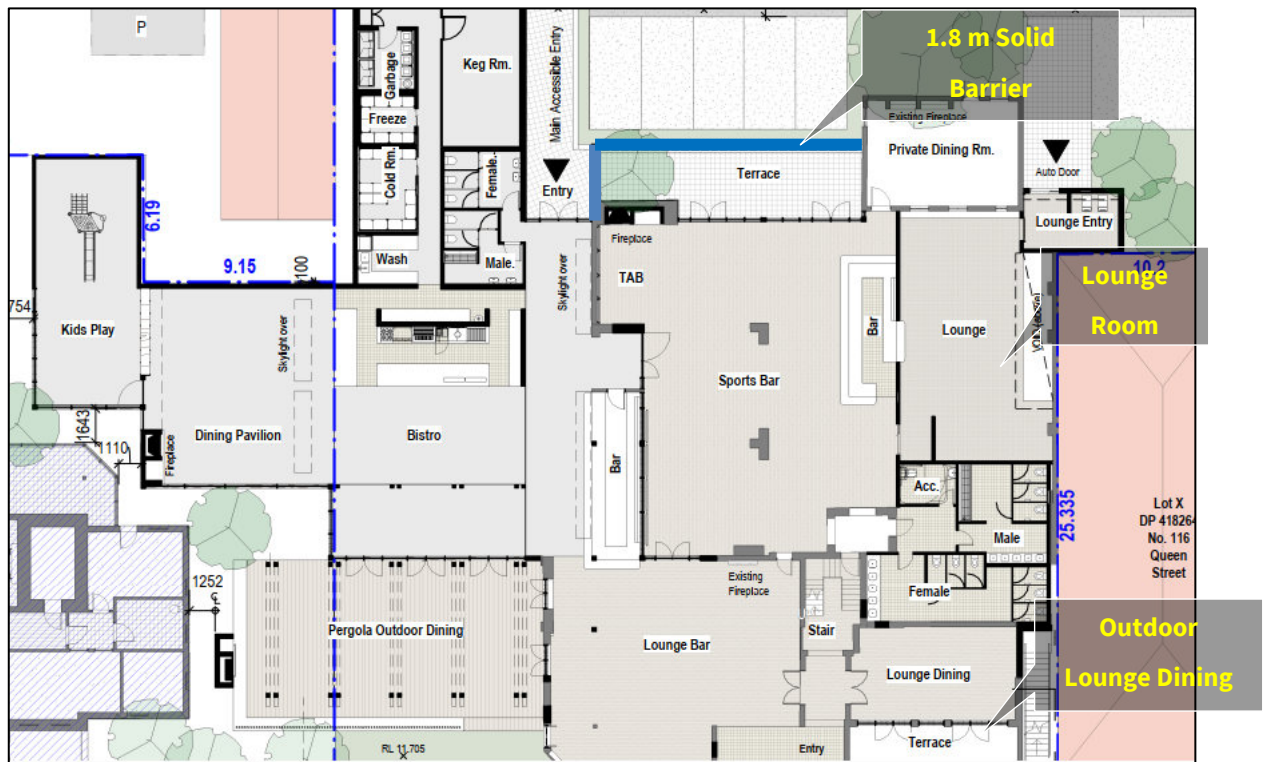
Barrier Recommendations – Image Source: H&E Architects
